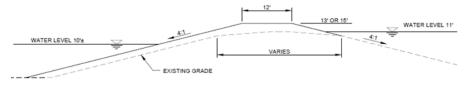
Typical Levee Cross Section(s) for Storage Ponds
